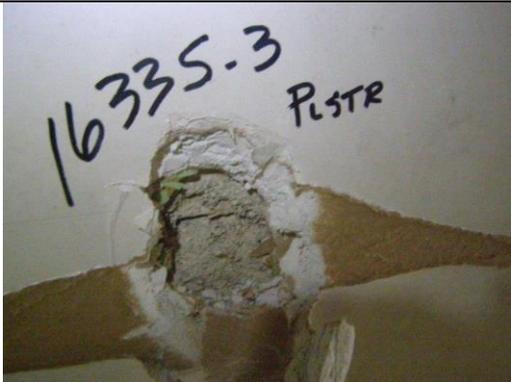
Plaster (1633S-3) Family Room, Wall D.
